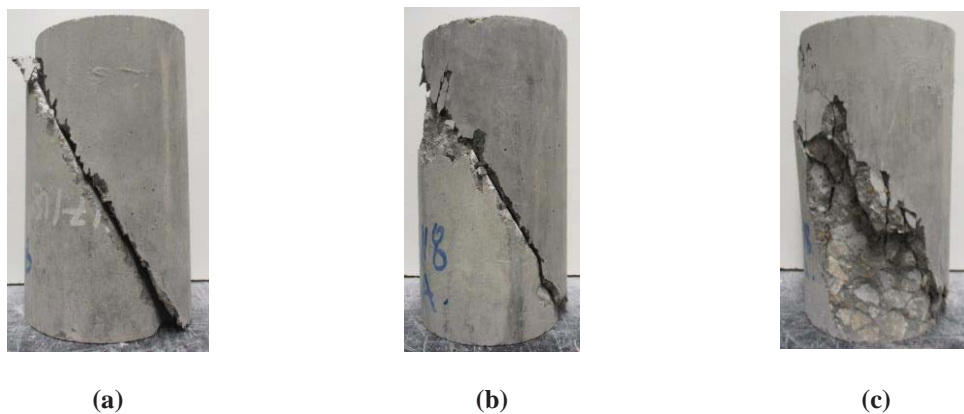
Slant Shear Specimen Failure Modes; a) Interface Failure, b) Interface Failure and CC Fracture, and c) CC Failure.
